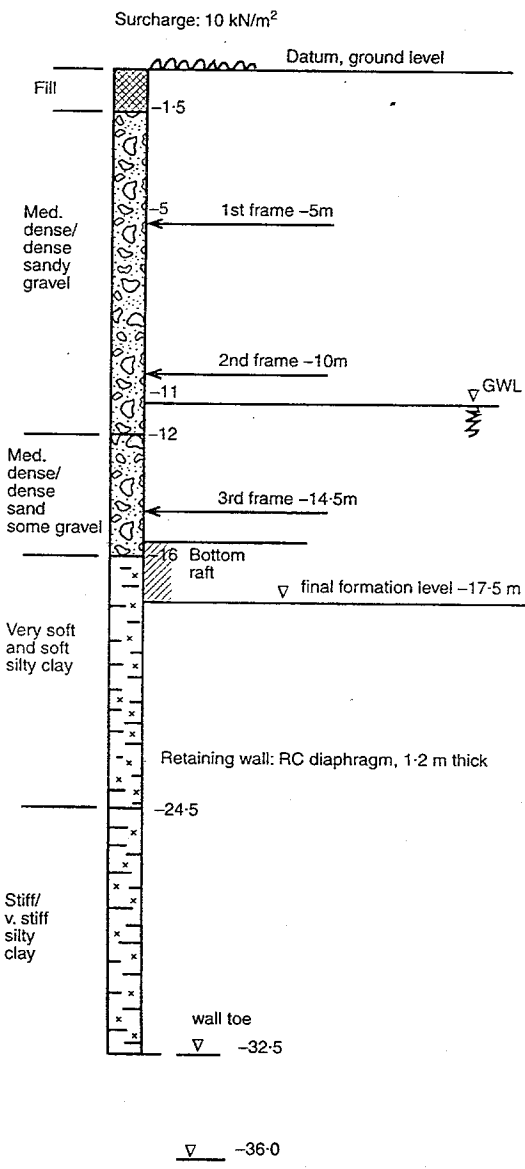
Case study braced excavation, layered soils with soft clay: wall geometry and soil conditions
